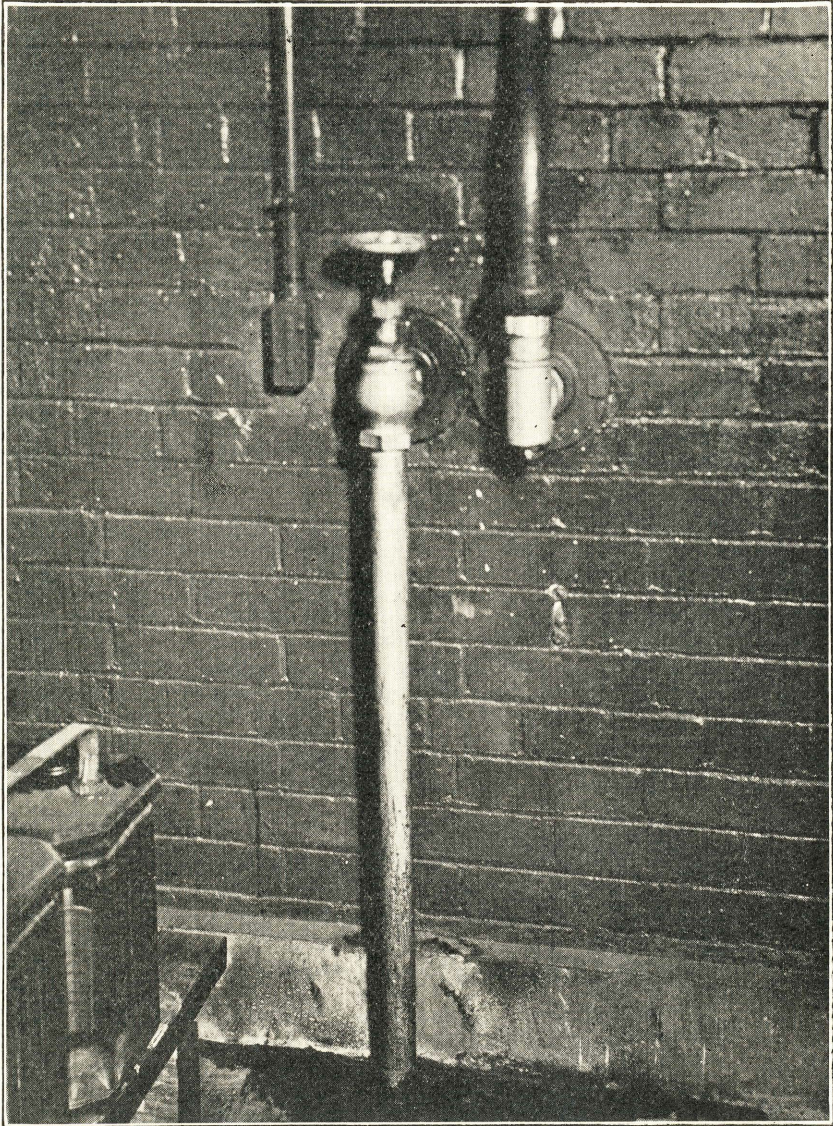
Such plumbing offers no opportunity for rats or mice to get into the building. Note that where the pipes penetrate the floor or wall they are closely surrounded by cement, bricks, or a metal collar.
